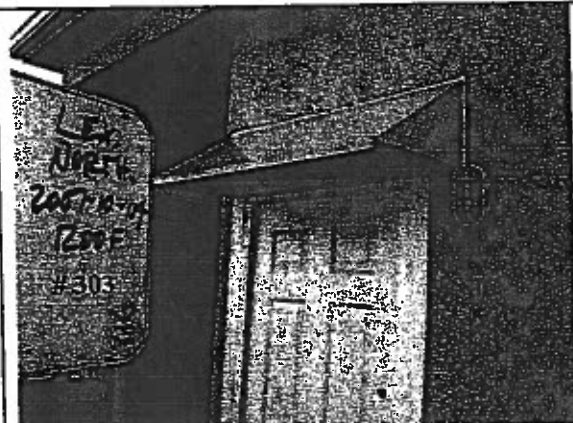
Unit #303 roof deck: metal awning added over roof deck door. Sealant will be a high maintenance item. Also occurs at #301 and #309.
